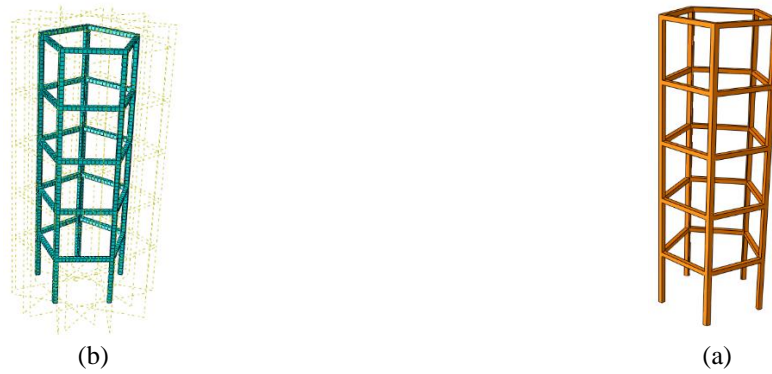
a) Unauthorized model for elementing b) Skeleton elementing
